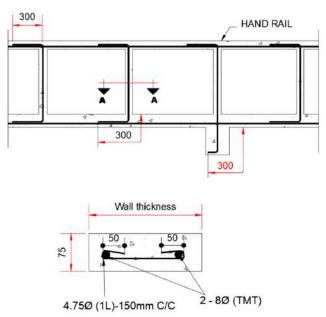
REINFORCING DETAIL OF PARAPETS
